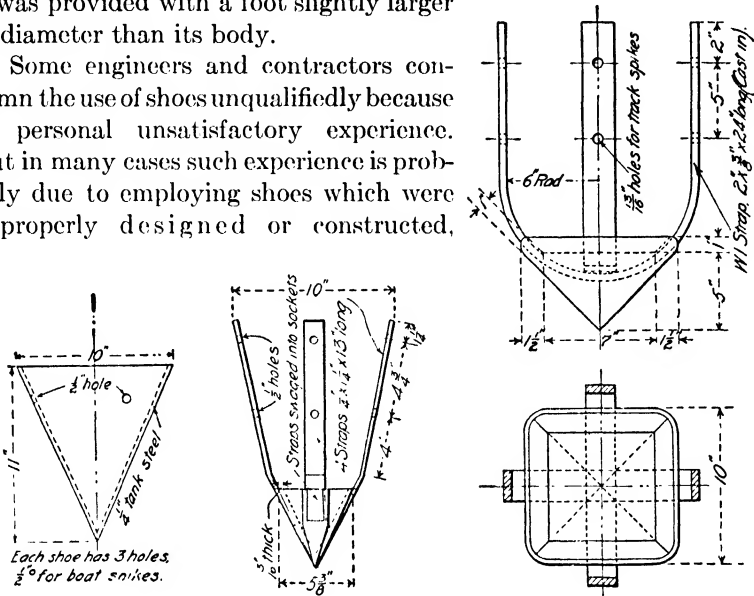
, b, and c.—Shoes for Timber Piles.
